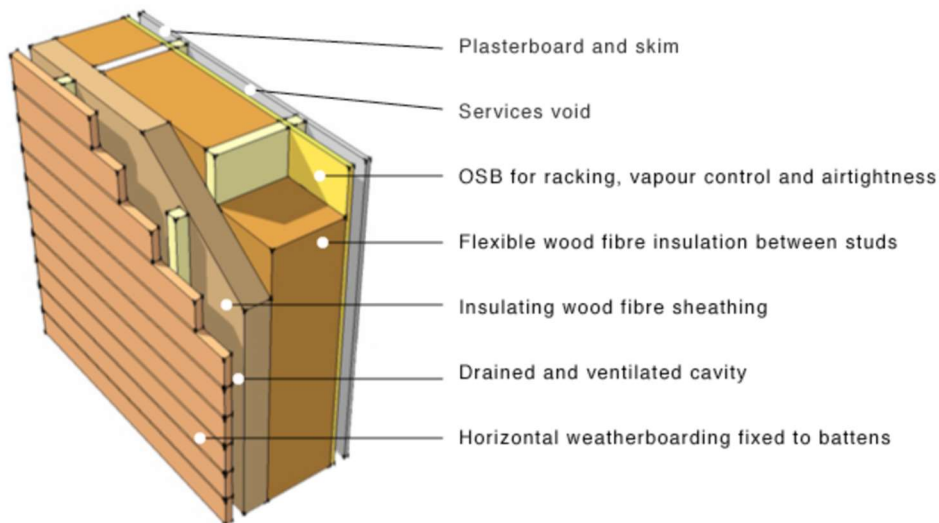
Wood fibre insulation between timber studs in a closed panel wall. Source: Green Spec.
